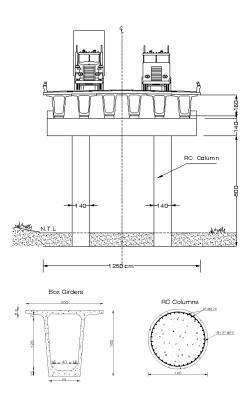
Plane, vertical view and details of the structure under analysis [cm].
